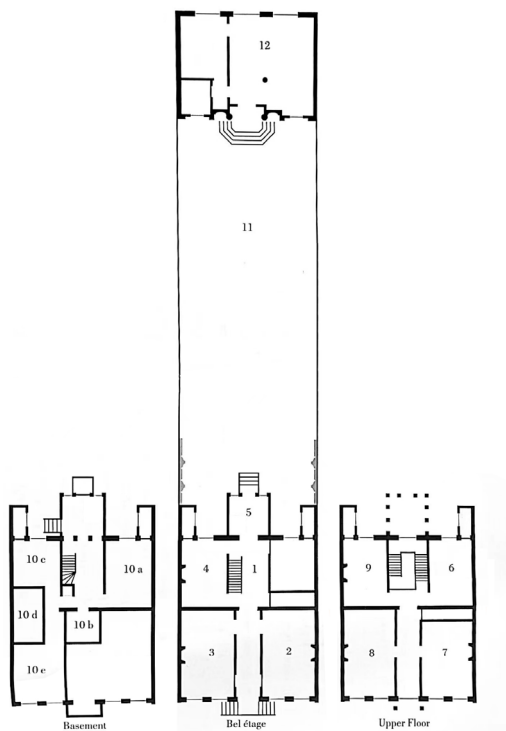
Typical plan of Amsterdam waterfront dwelling
